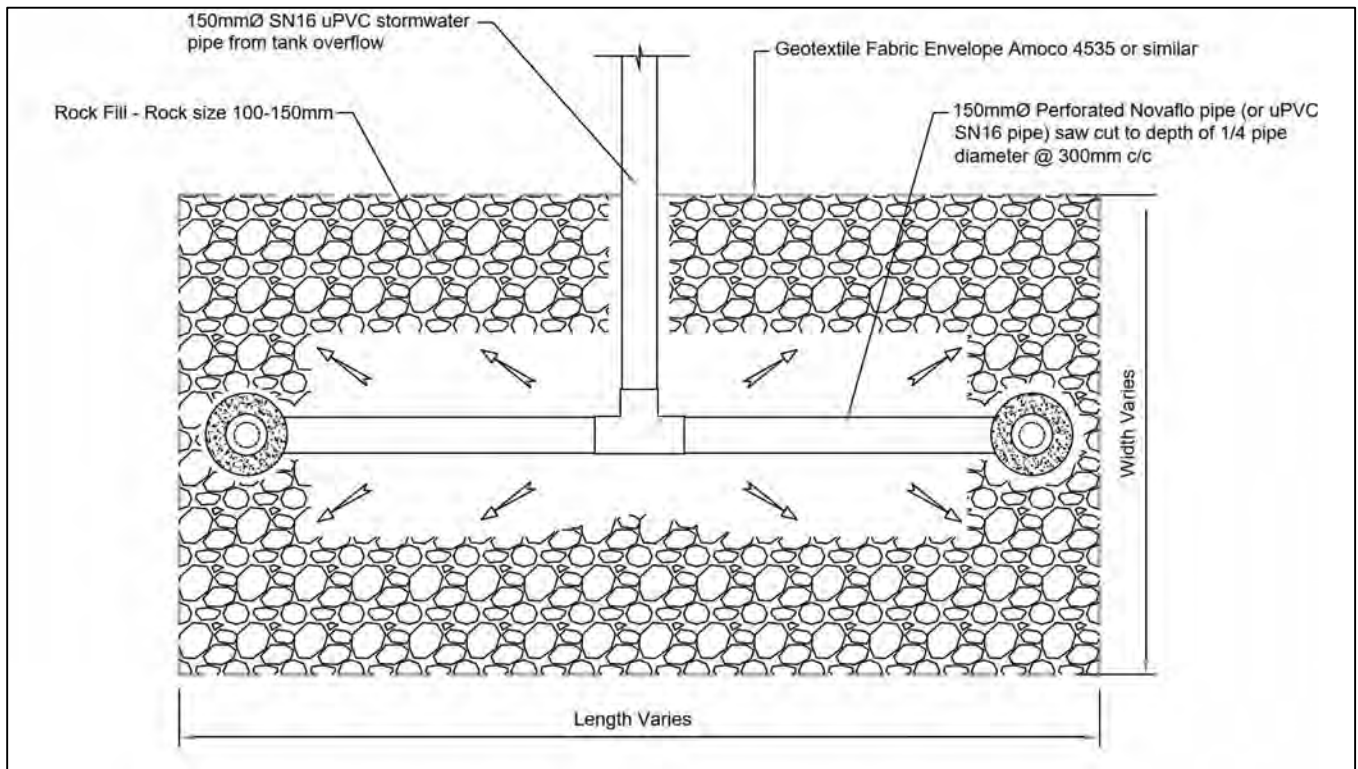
Soak Pit for Dwellings – Rock filled (Plan View)
